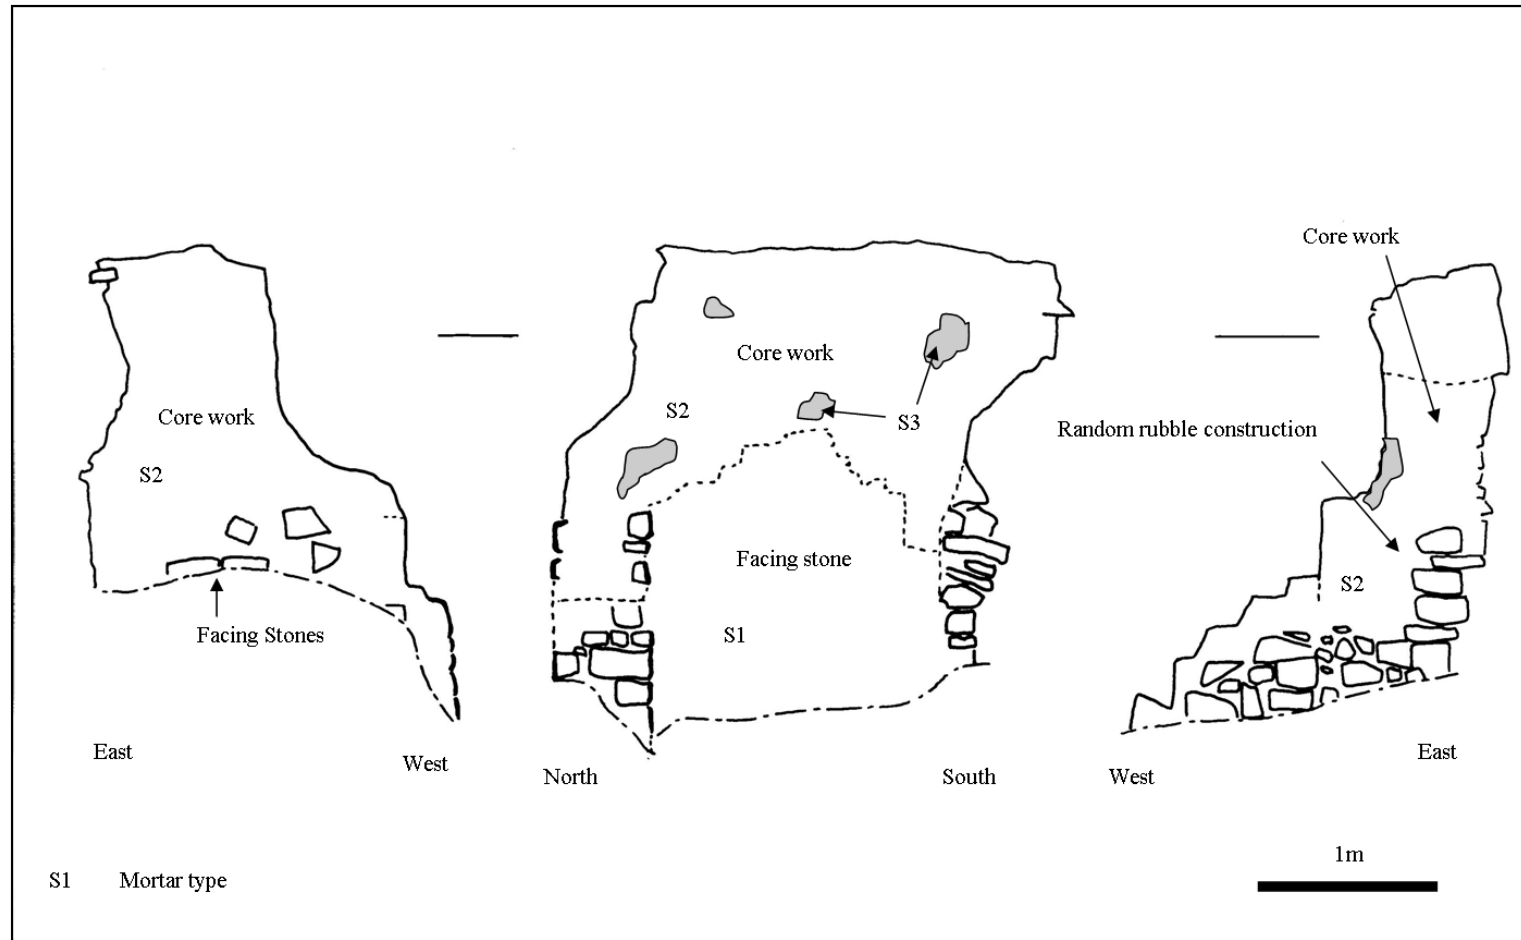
Profile of the stair tower after cleaning but prior to consolidation (north elevation, west elevation [after excavation], south elevation).
